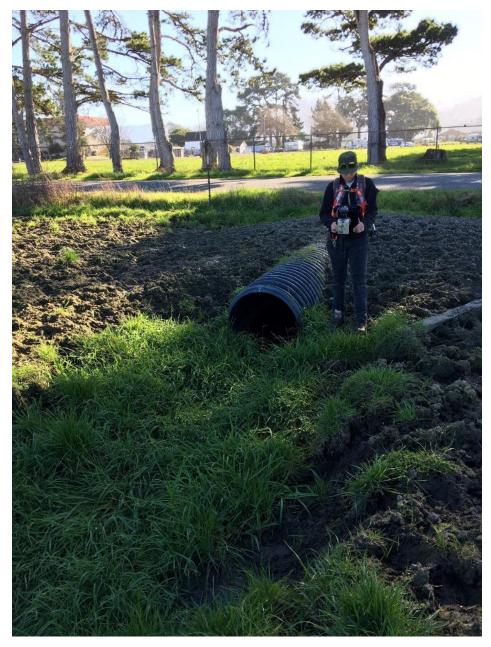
Culvert connecting Wetland 2 - South with Wetland 2 – North beneath Van Ness Avenue.
